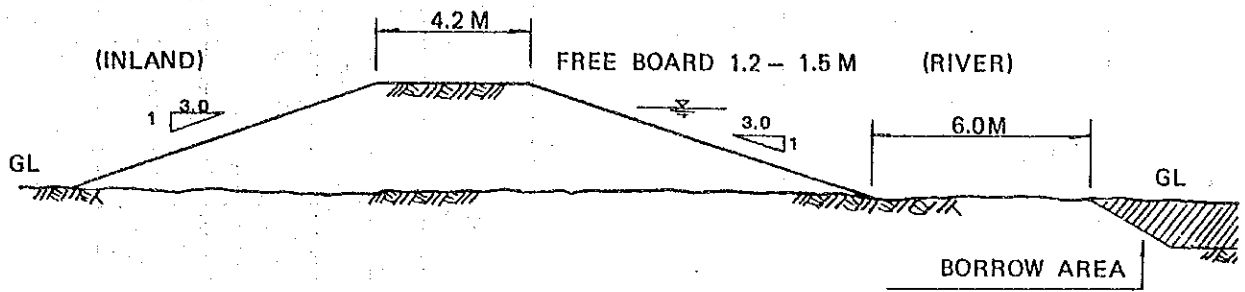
Standard Cross-Section of Present Flood Embankment
